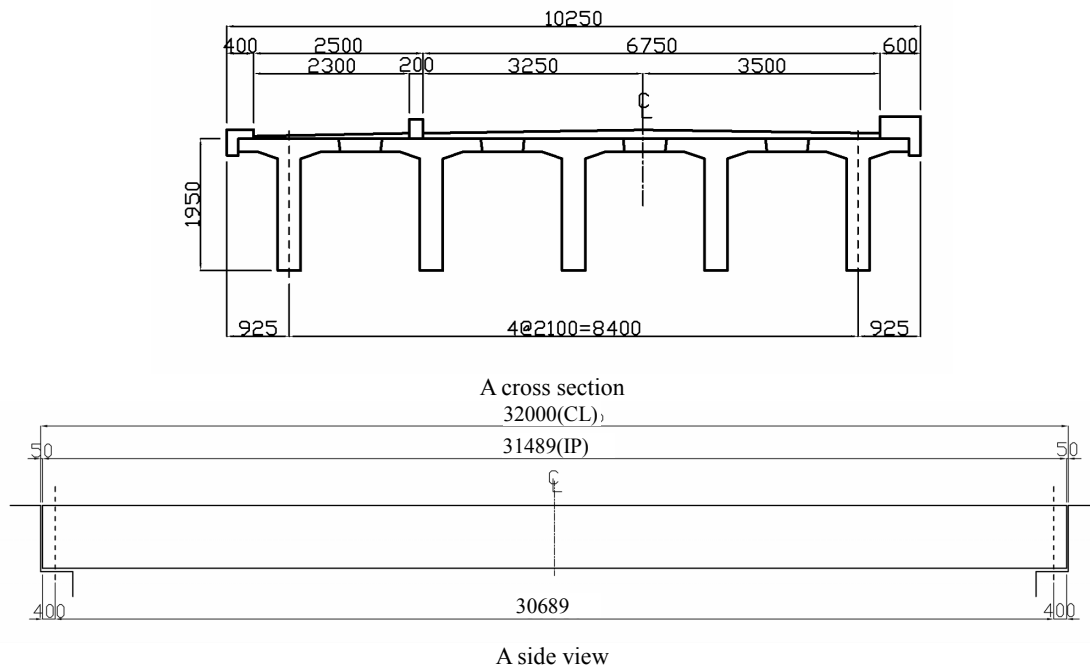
Schematic view of a prestressed concrete bridge studied.
